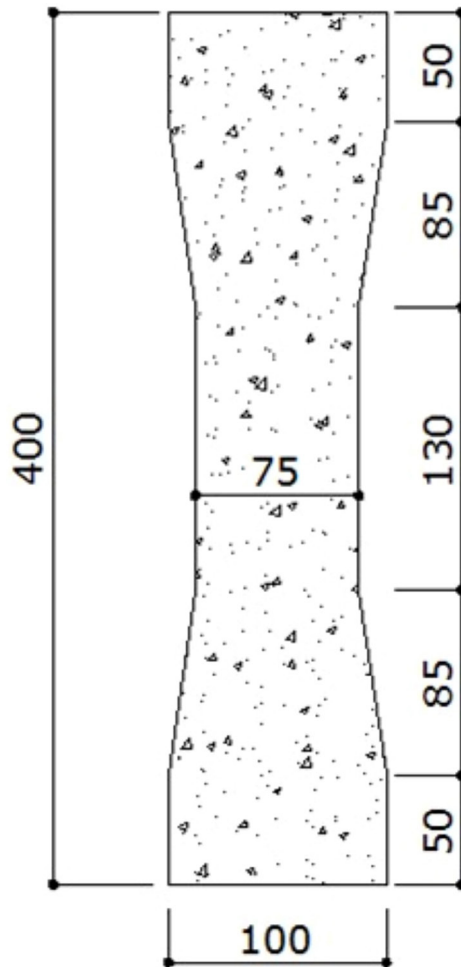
Dimensions of the cylindrical specimen used in the direct tensile test (mm).
